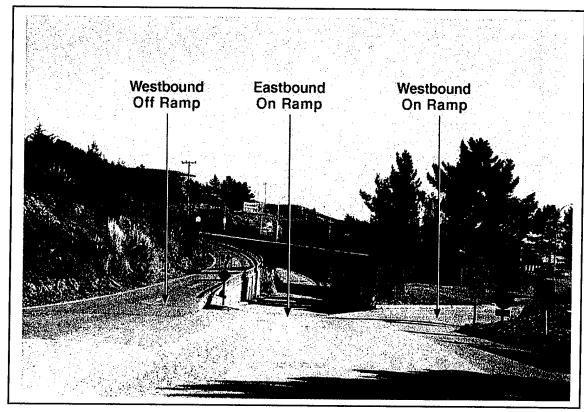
On and Off Ramps to I-580 from Western Drive
